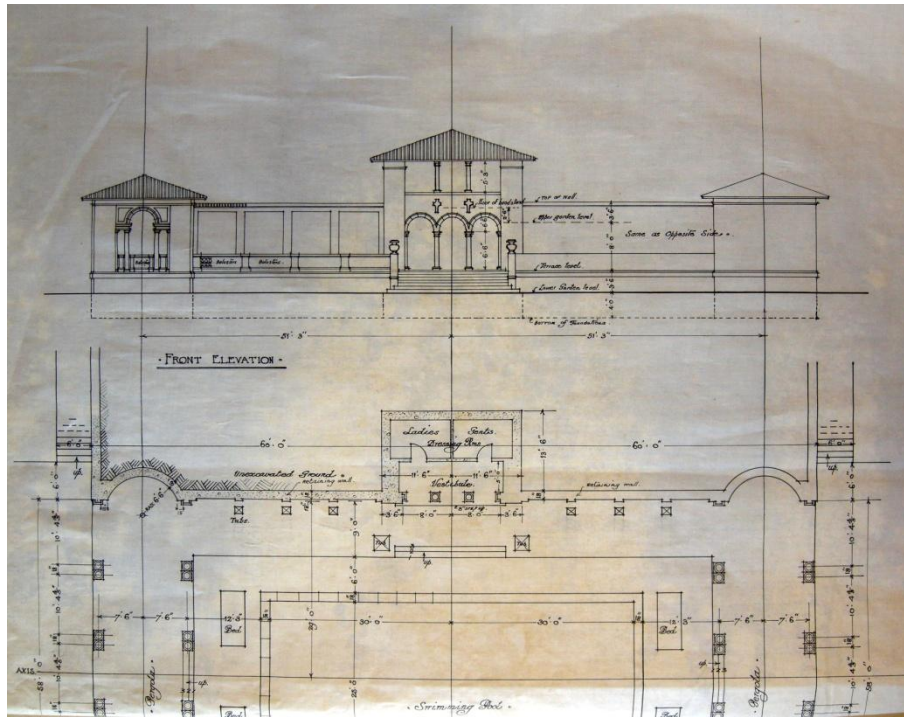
200 John Street, Designed Landscape, First Pool and Pavilion Design, Undated
